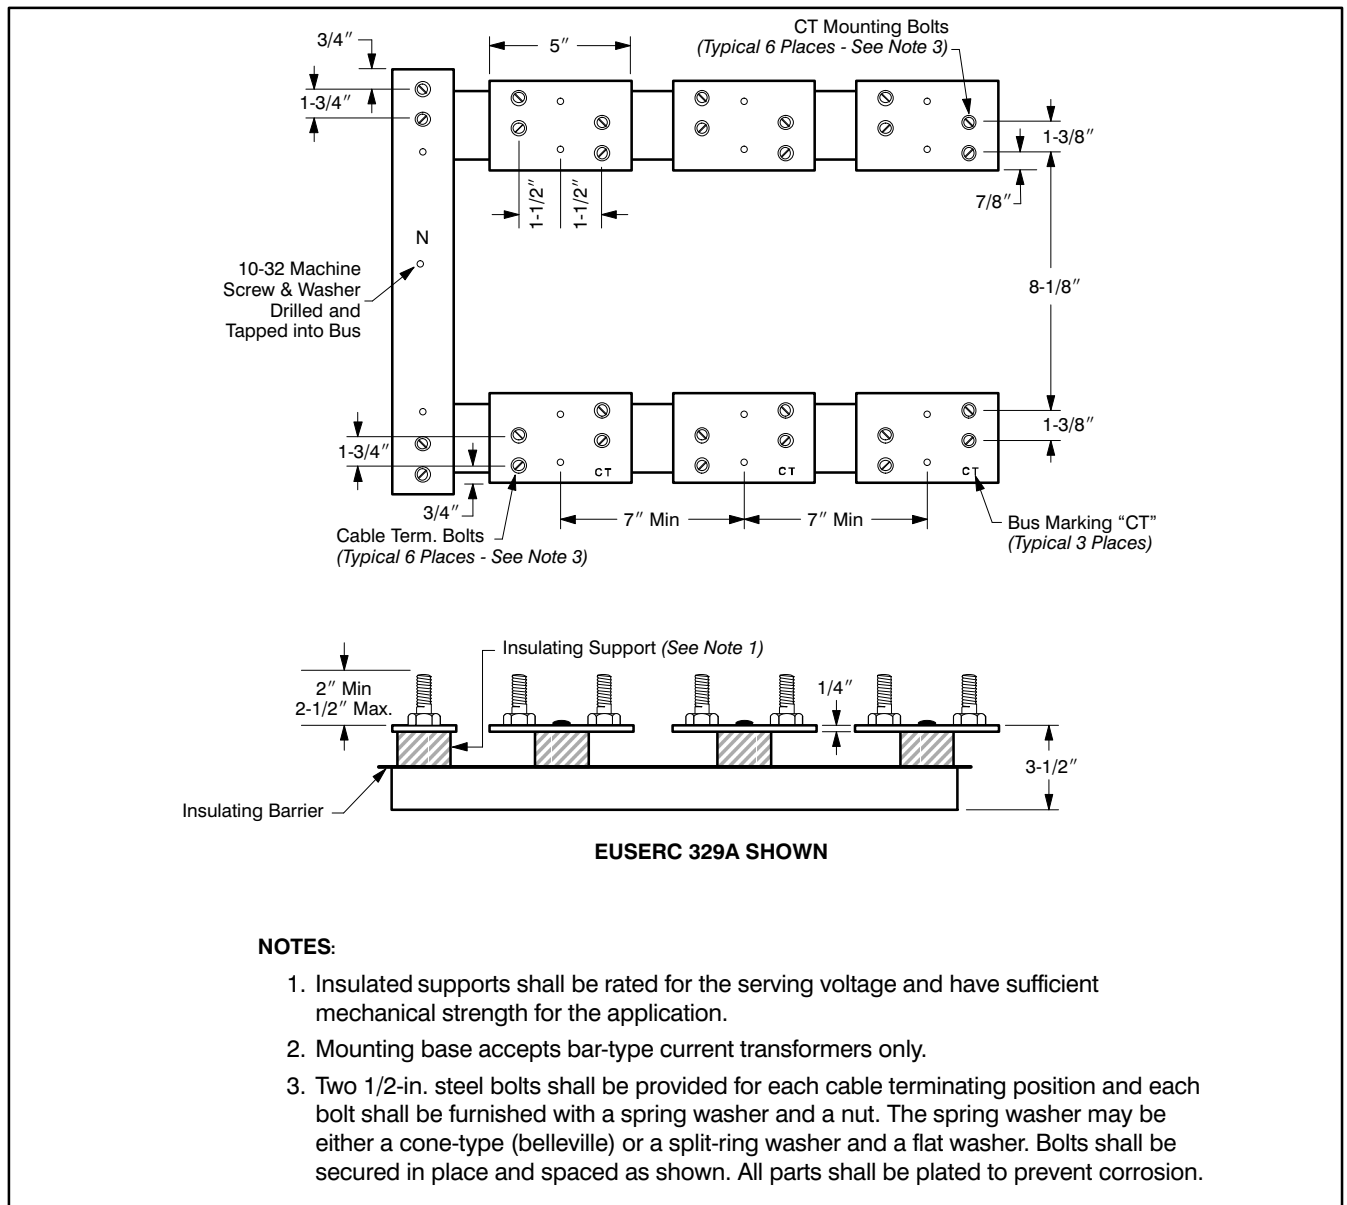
Three-phase CT mounting base bracket. EUSERC 329A (shown) or 329B
